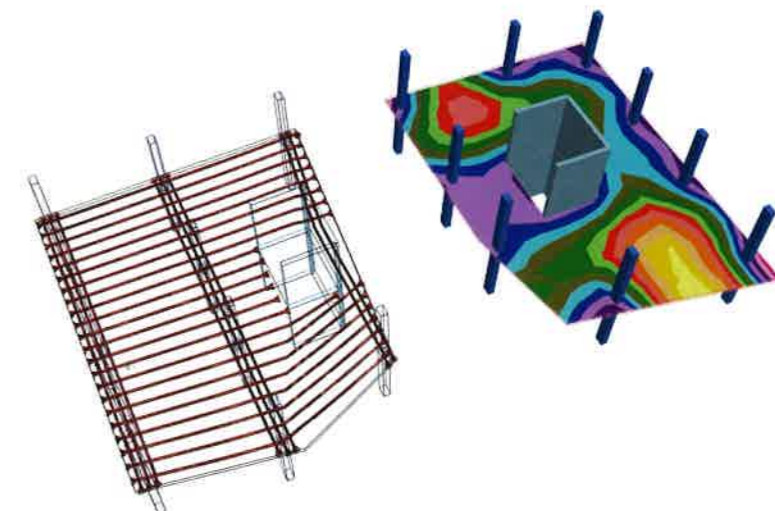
E-2 Tendon Layout and Deformation of a Single Level Extracted from the Entire Building Model (Edge; P132)
